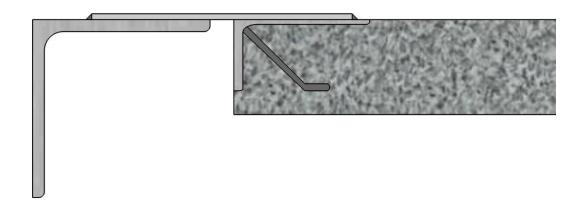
Section cut slab-beam welded connection, side view
